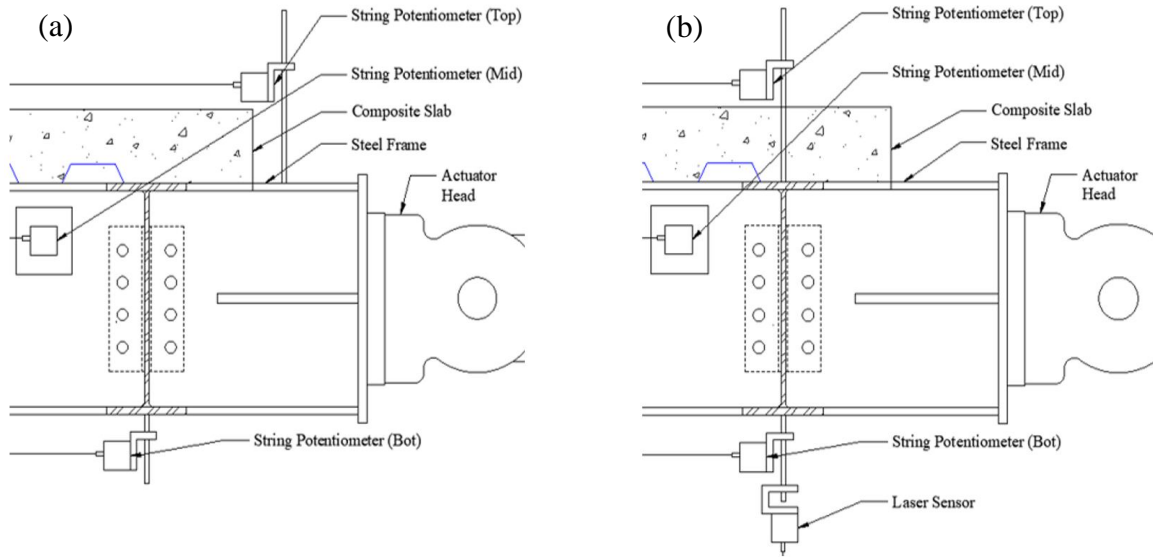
Instrumentation Detail: Specimens 3/7.5-4-N-NF-DT, 3/6.25-4-L-NF-DT, and 2/4-4-L-NF-DT (a). Typical configuration (b)
